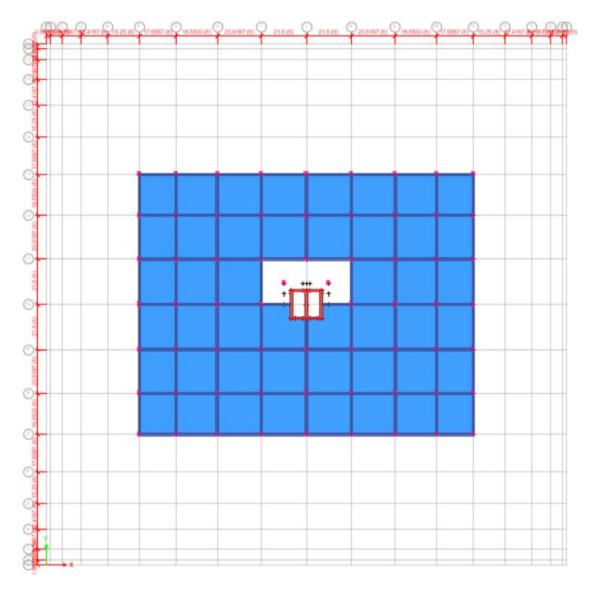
(c): 11th Floor Plan View of Braced Structure
